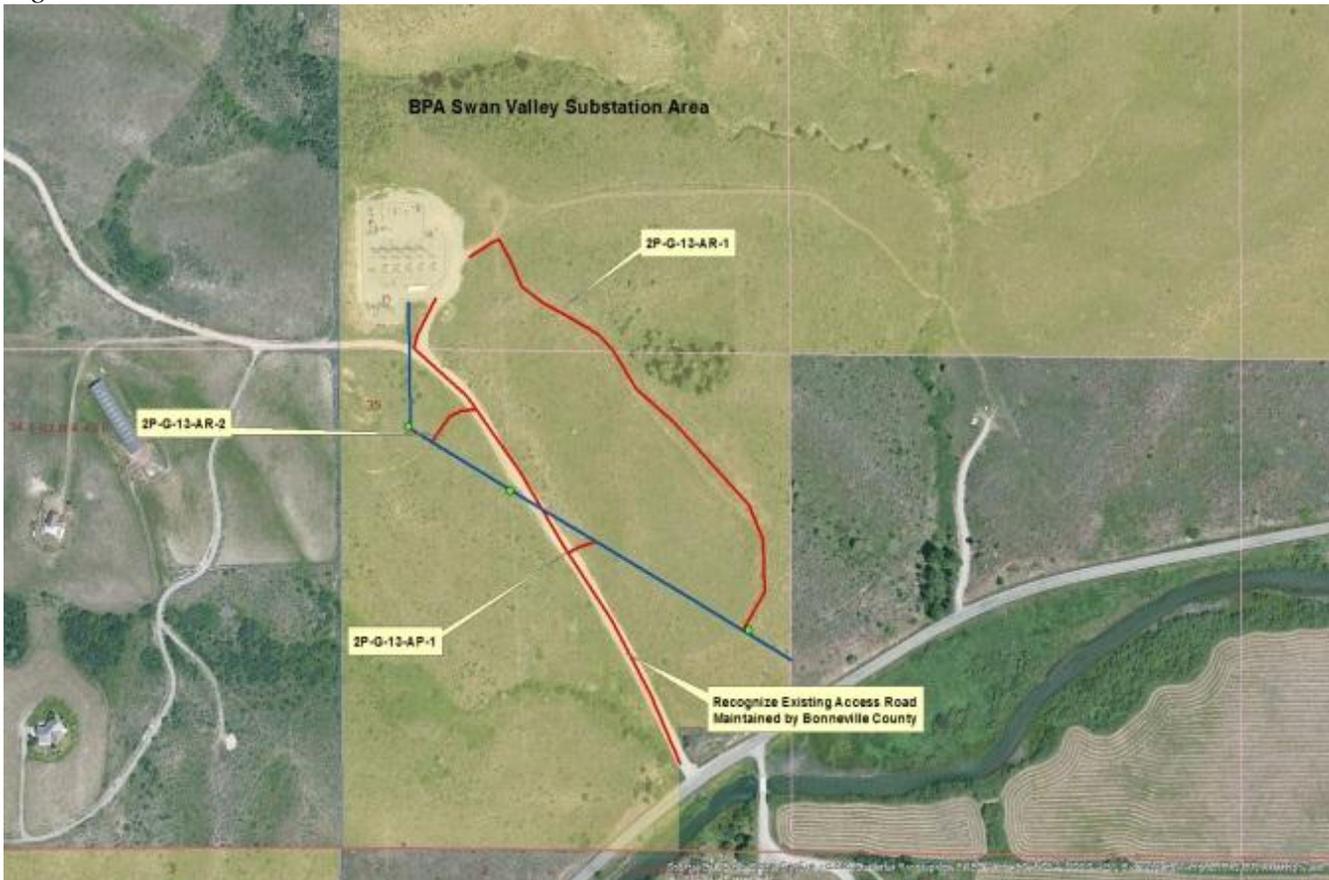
Note: The green dots indicated the structures on BLM to be replaced and upgraded
